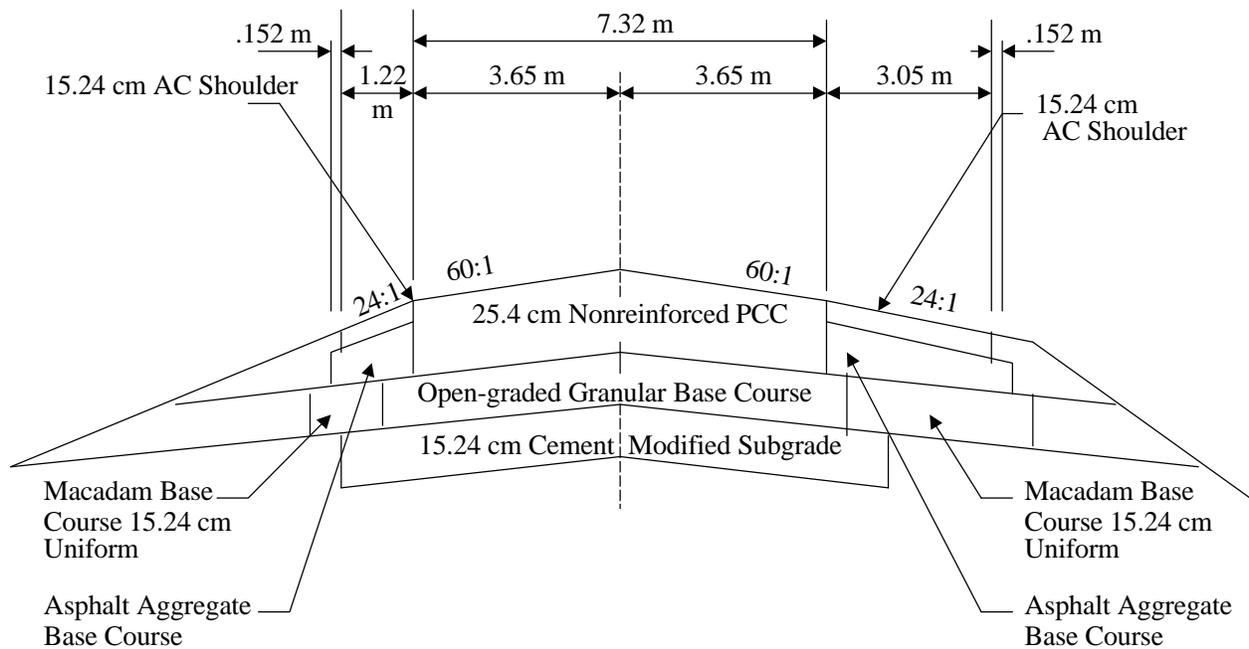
Unbonded concrete overlay alternative for example problem 5.
